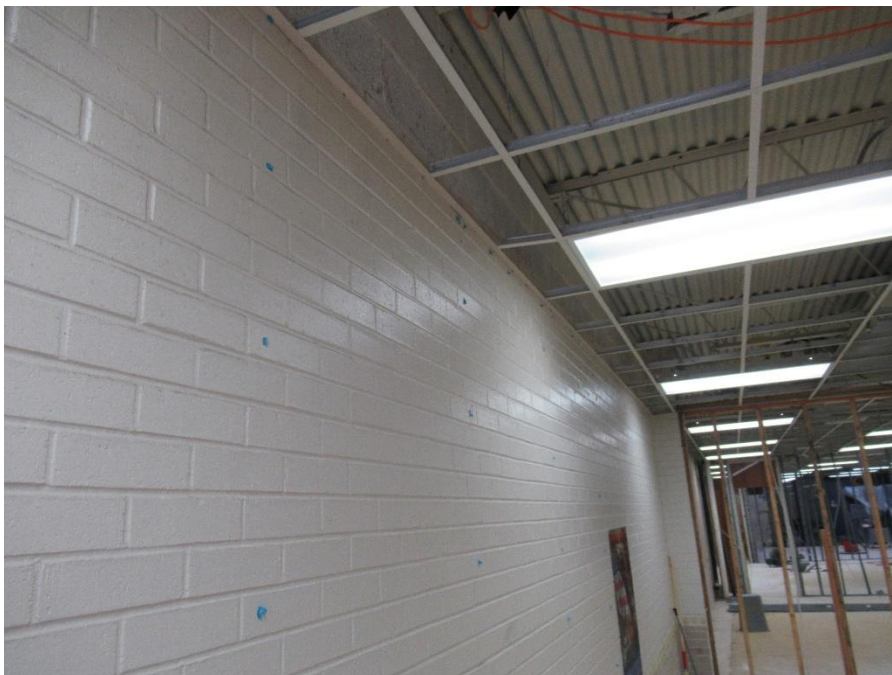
Original roof steel joists bearing on CMU and brick infill perimeter walls
